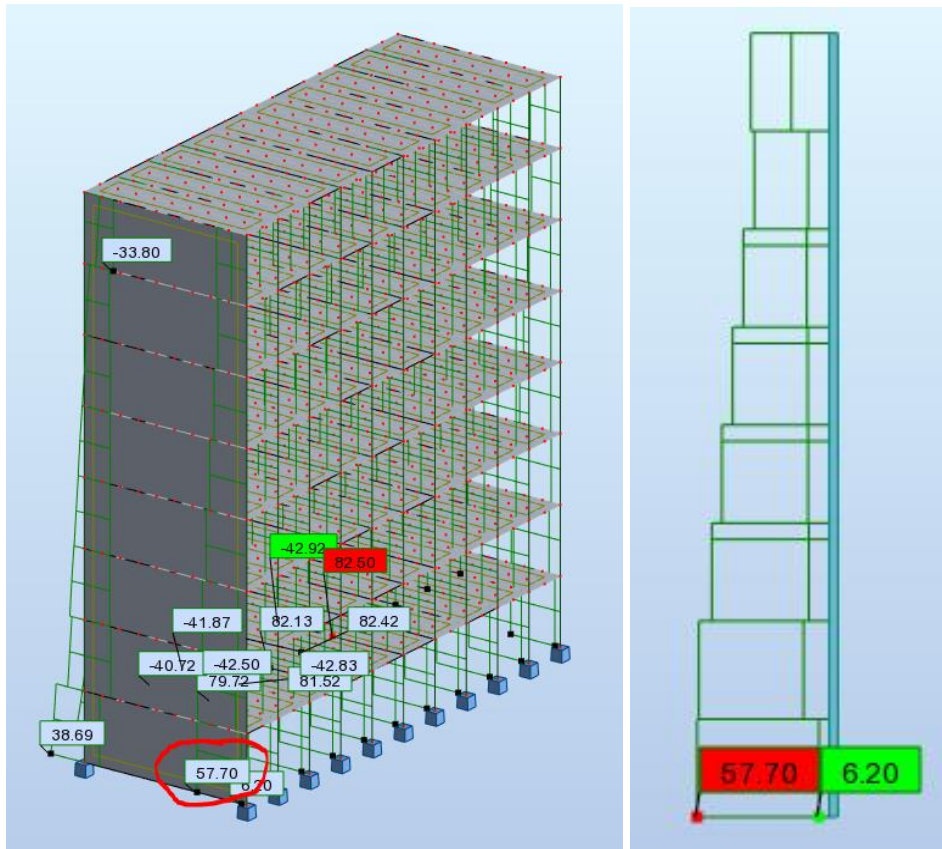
Shear forces in eight story concrete building (all the numbers were needed to show the relevant one, because the worst shear forces in the columns are not in the foundation).
